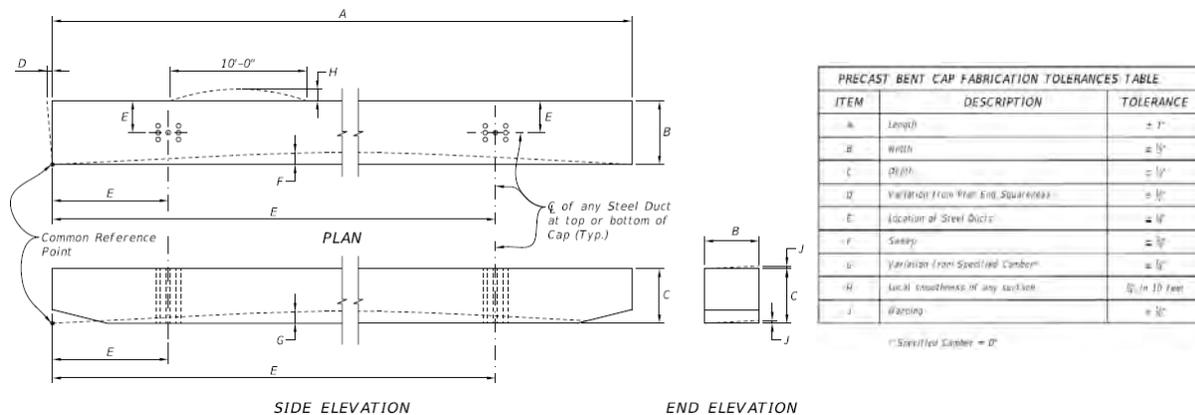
Standard Fabrication Tolerances (Multi-column Pier Cap)
